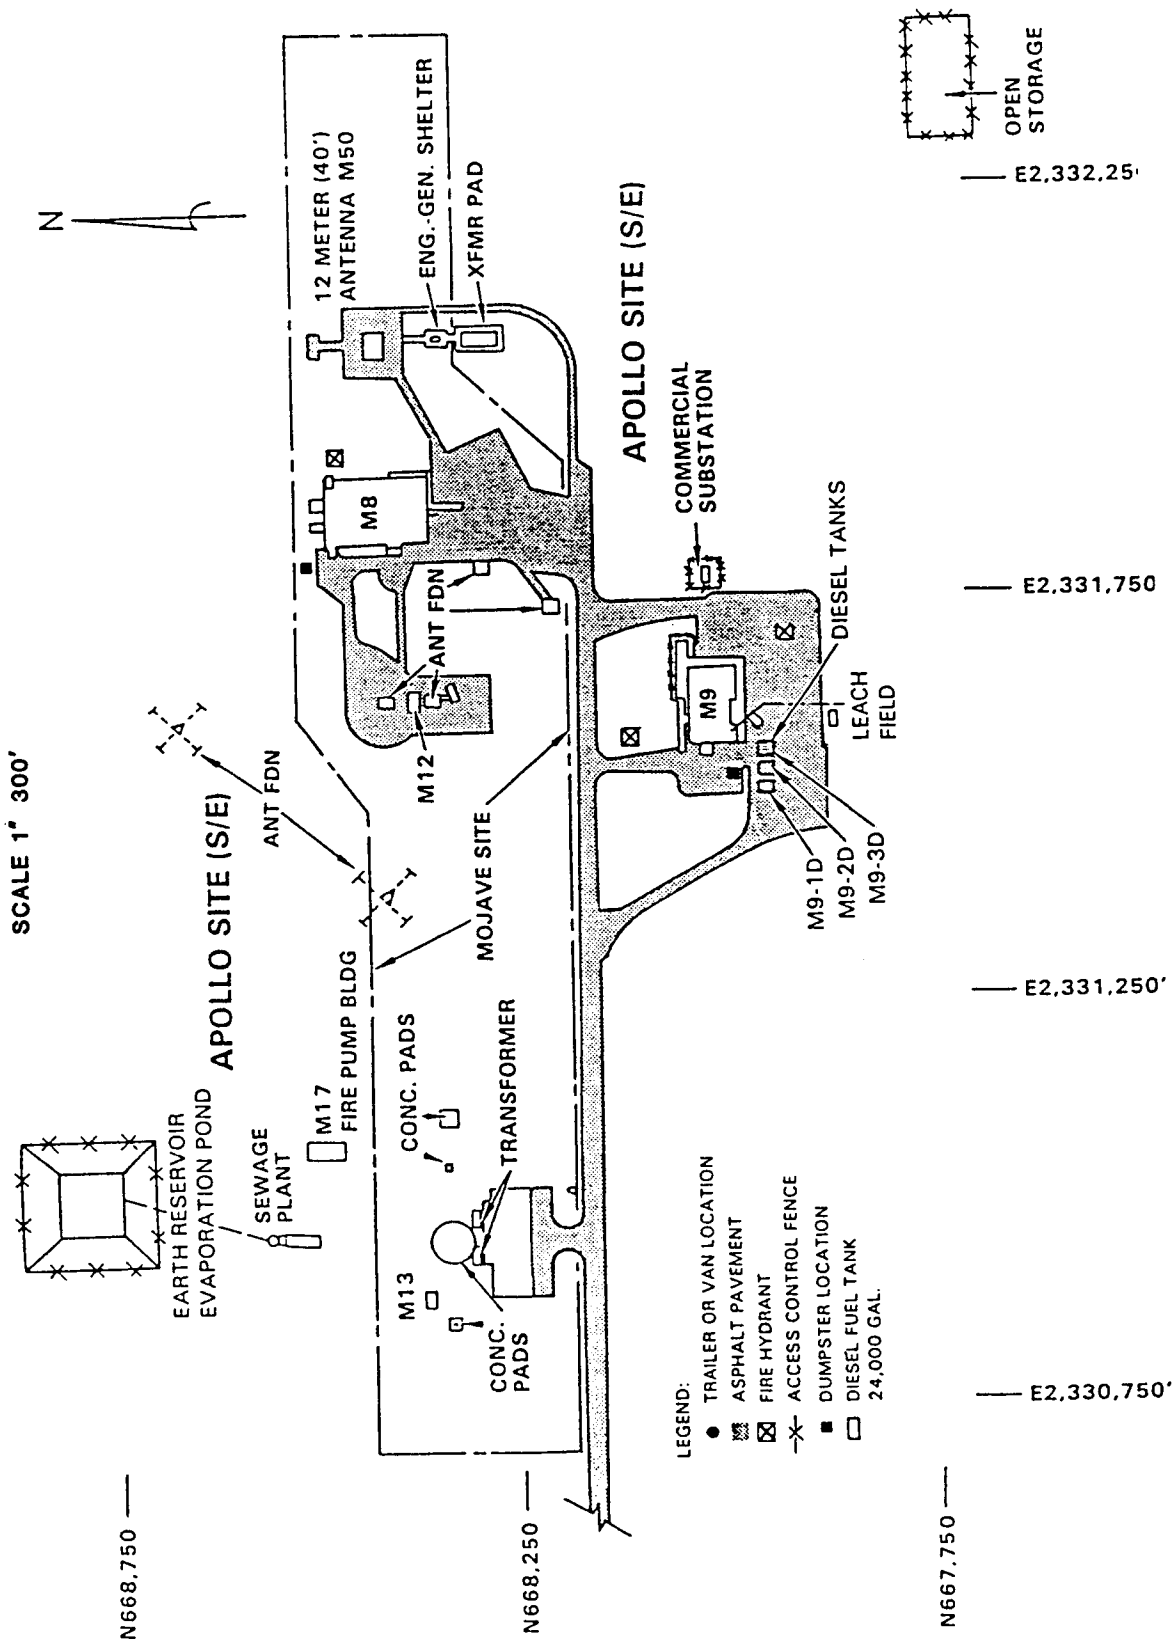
Mojave Base Site: Plot Plan and Location of Abandoned Sewage Treatment Plant and Sewage Evaporation Pond
